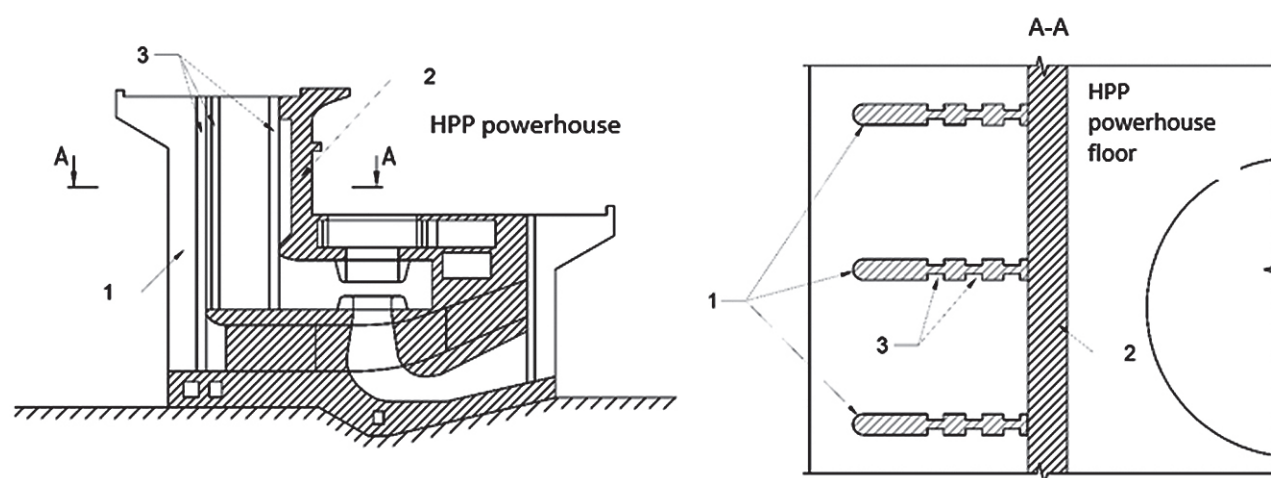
Vertical section along the flow of the head run-of-river powerhouse of the HPP: 1 – piers; 2 – upstream wall of the powerhouse. Section A-A shows: 1 – piers; 2 – upstream wall of the powerhouse; 3 – gate slots
